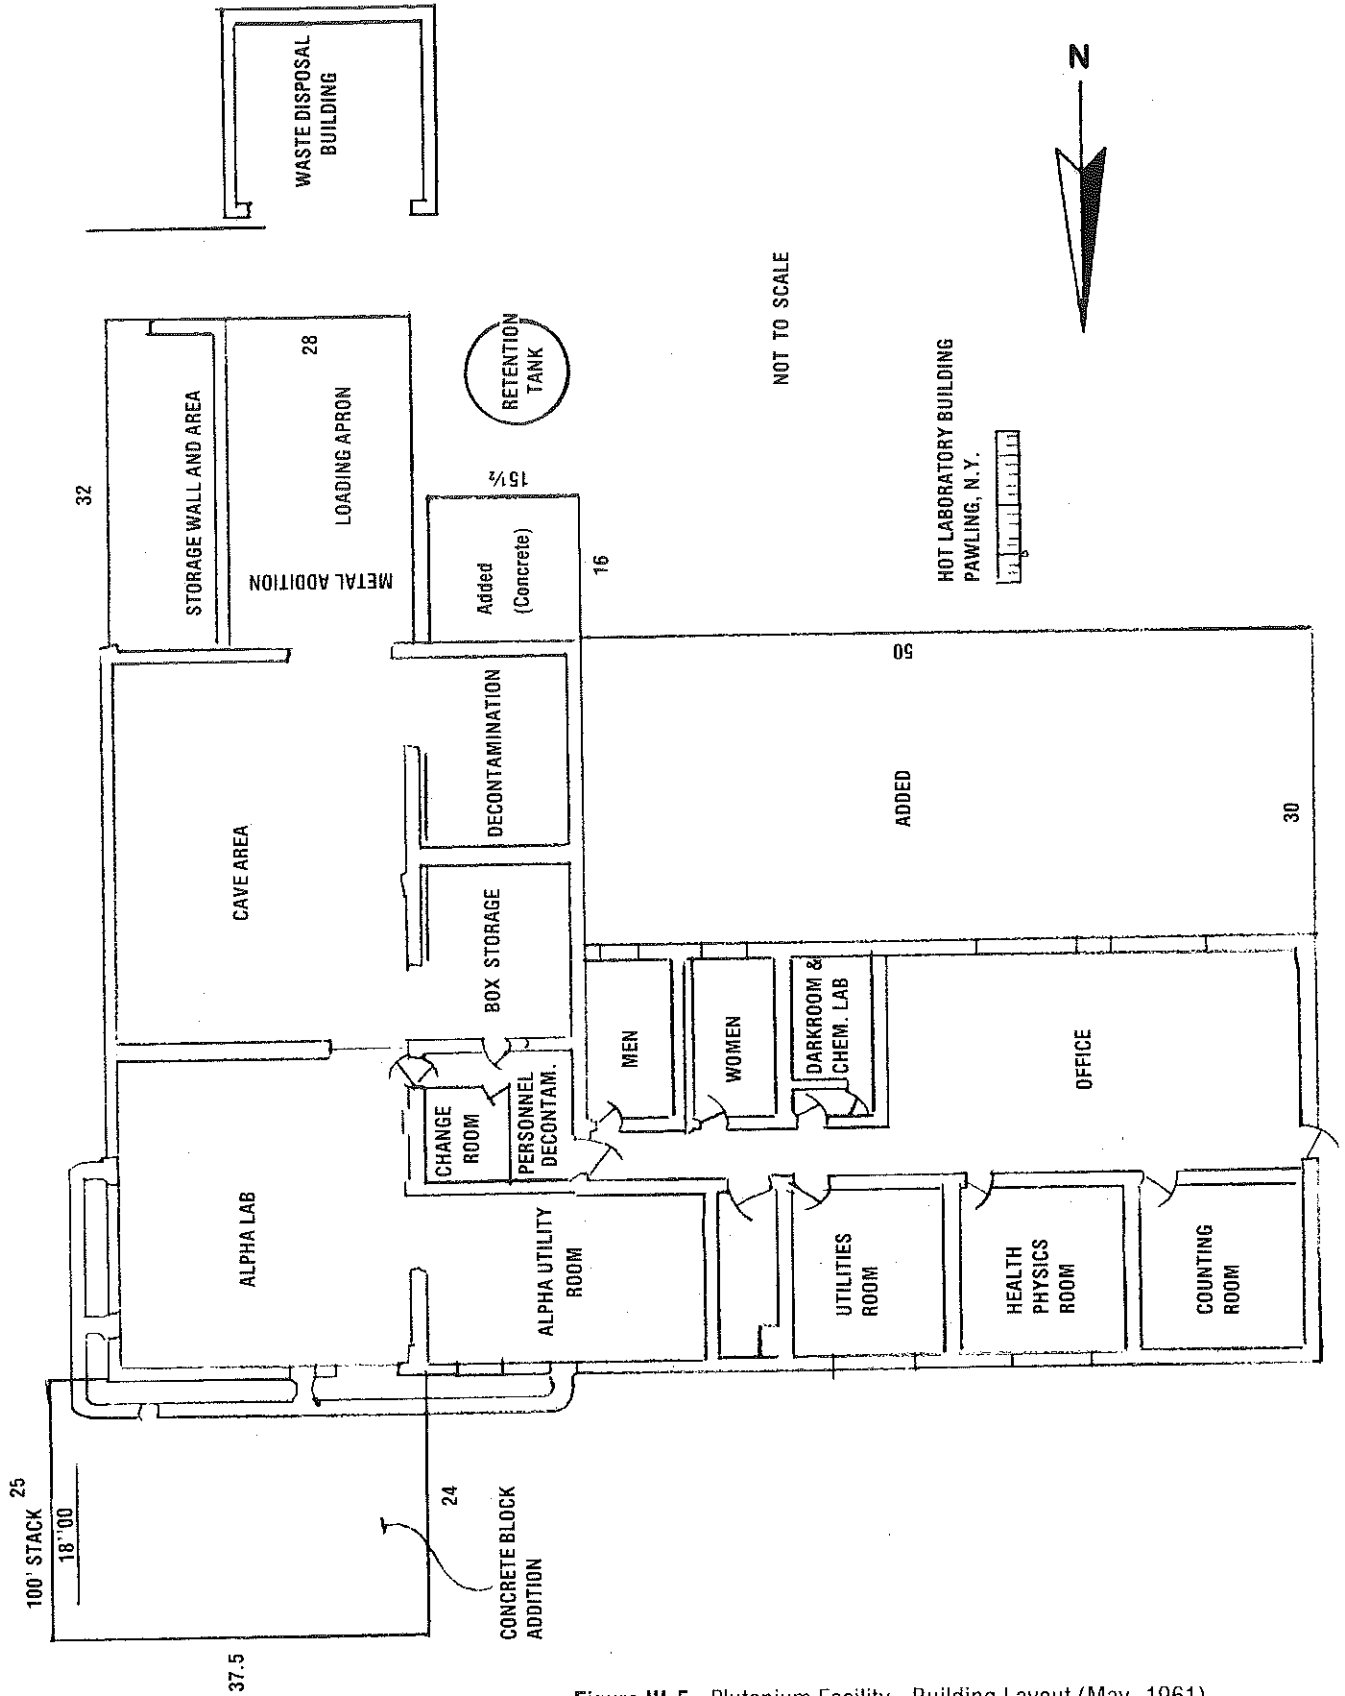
Plutonium Facility - Building Layout (May, 1961)
